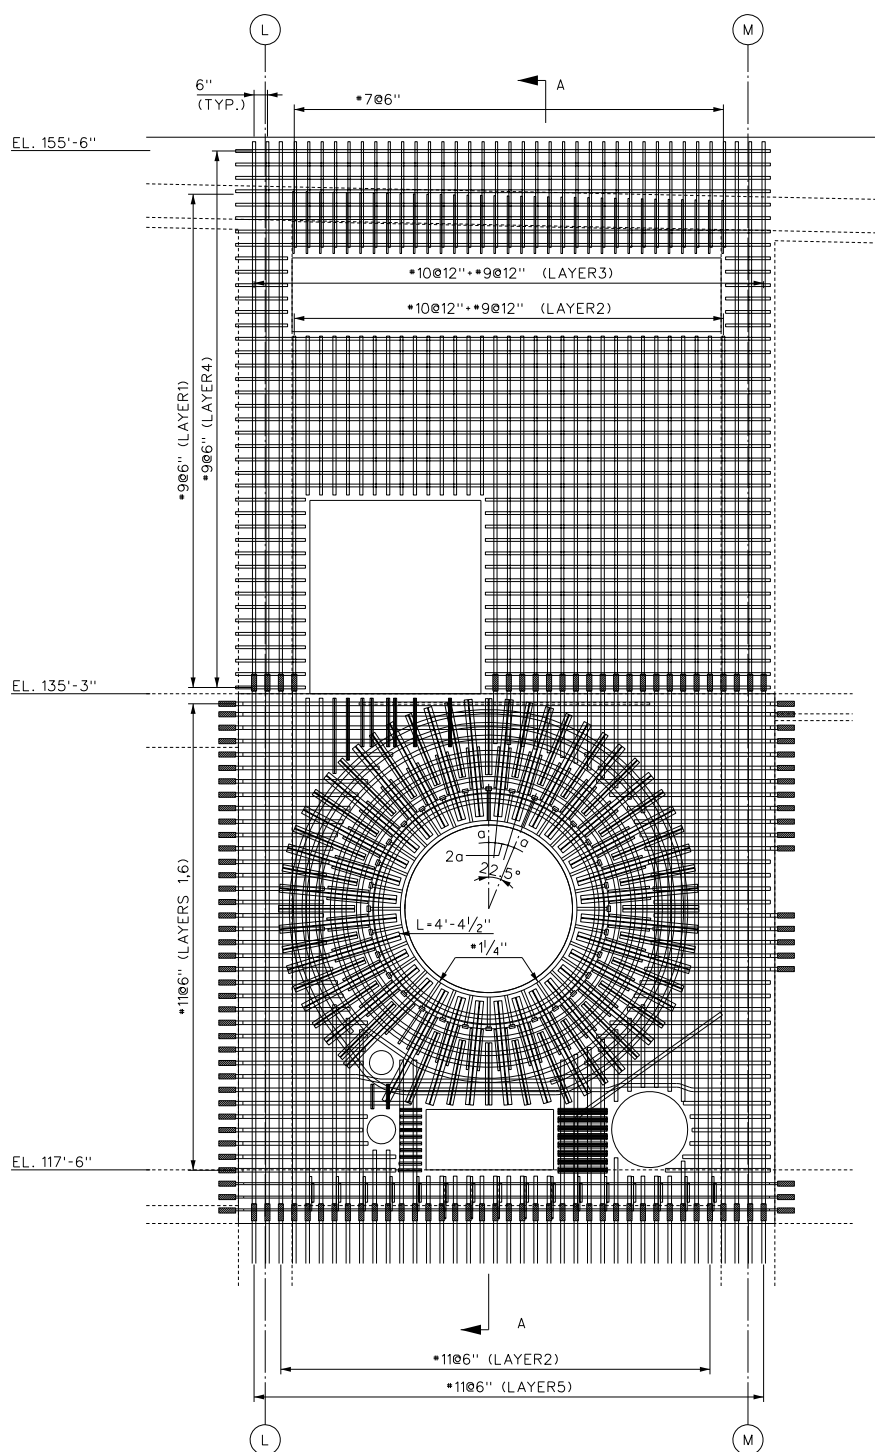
H.5-5 (Sheet 1 of 3) [Concrete Reinforcement in Wall 11]
